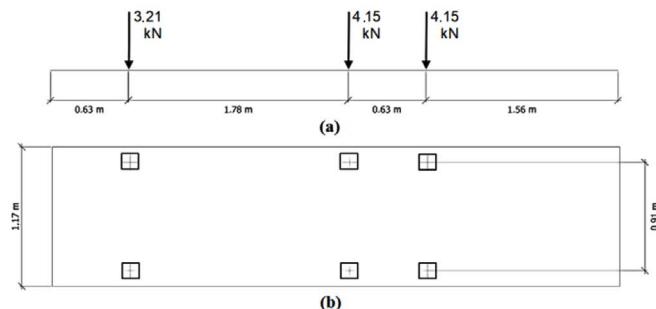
Vehicle layout and dimensions of the reduced model: (a) elevation view, (b) floor plan. Source: Prepared by the authors.
